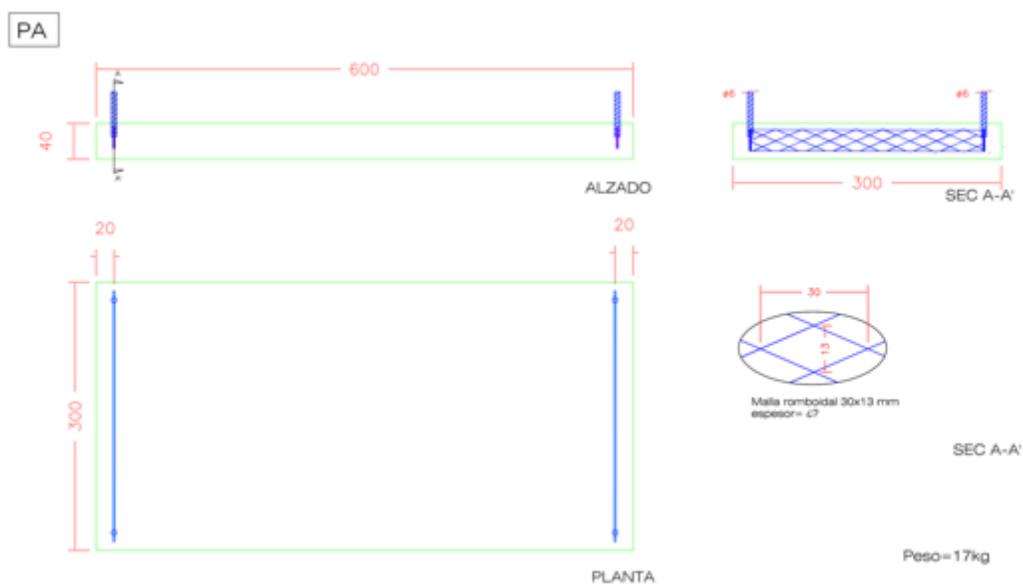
Design of the conductive concrete slab sample 300x600x40mm with steel deployé sheets
